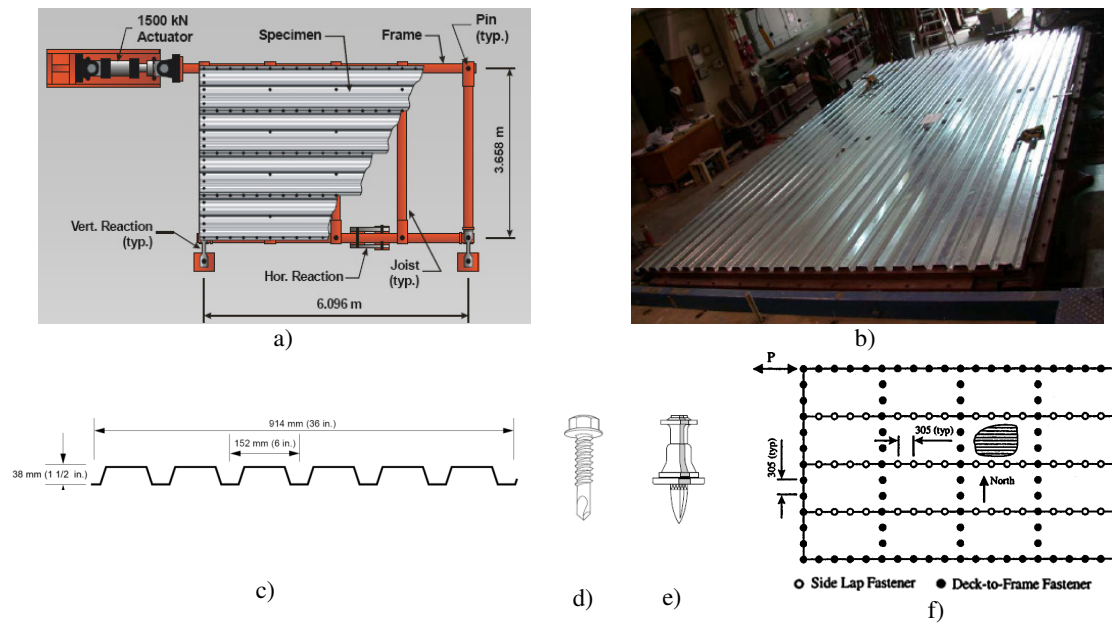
Steel diaphragm test (Essa et al., 2003): a) cantilever diaphragm test setup, b) plan view of tested diaphragm, c) Canam deck profile (nestable), d) Screw fastener, e) Nail fastener, f) Fastener locations
